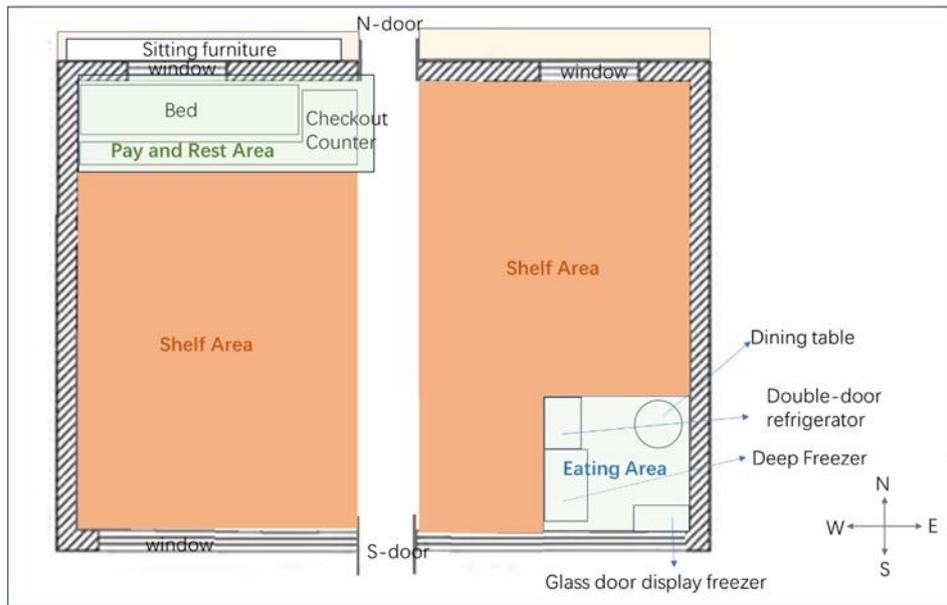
Furniture layout of the D93008 village shop converted from the Type B house
